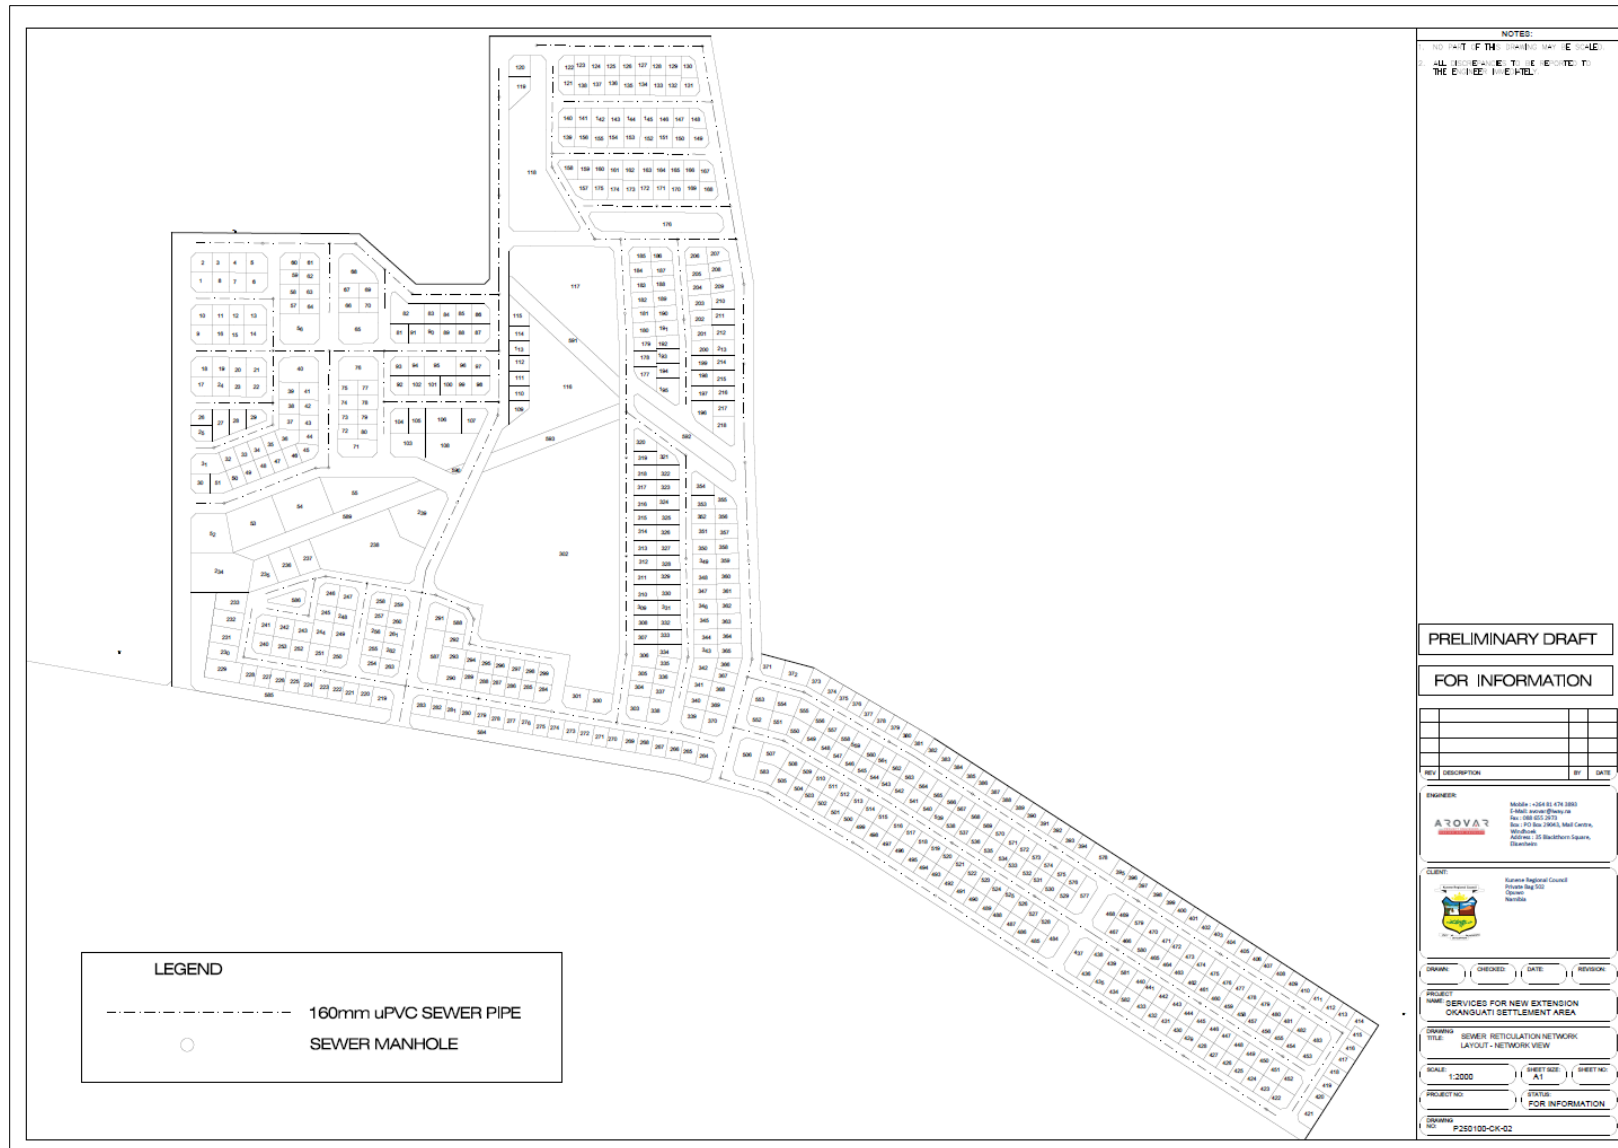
Available preliminary draft drawings of the proposed sewer reticulation network of the New Extension in Okanguati Settlement (source: Arovar Project Engineers, 2025)
